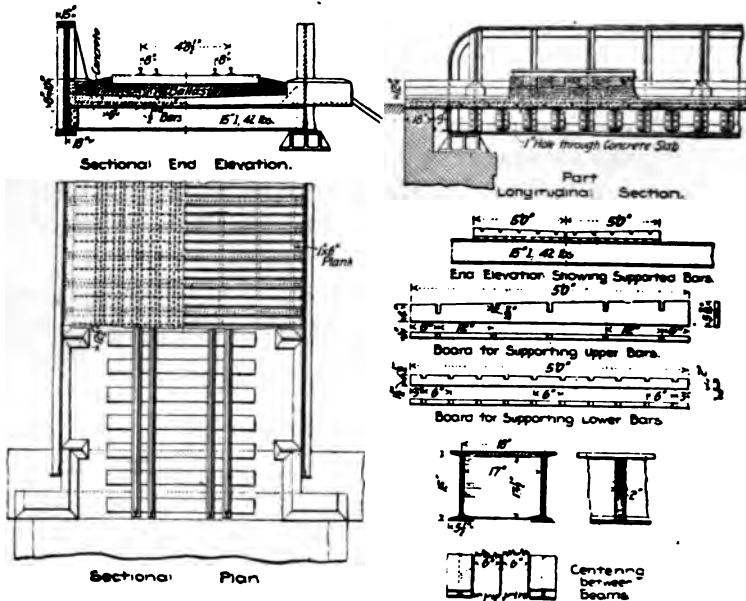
Floor for Through Bridges, Wabash Ry.
